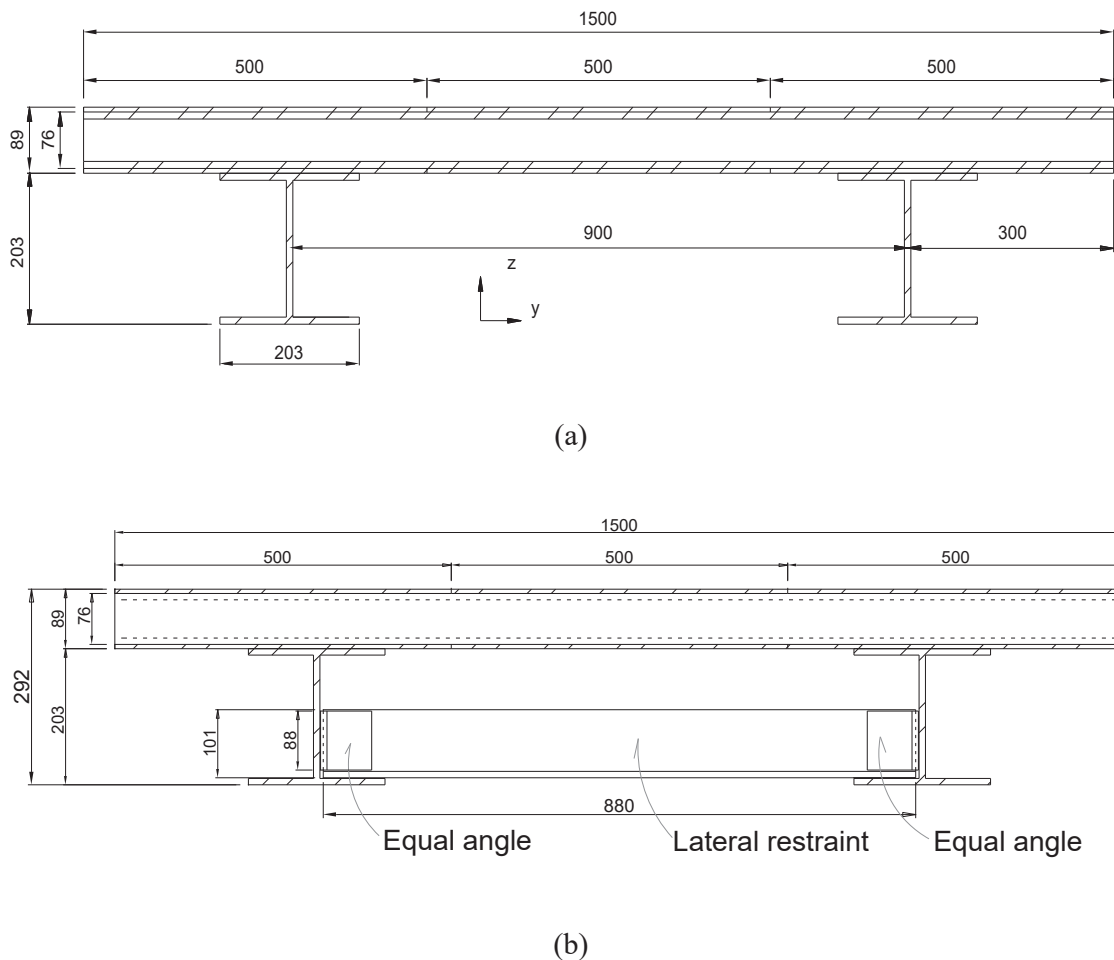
Dimensions of cross-sections along the MB: (a) typical cross-section, and (b) cross-section with T-beams (units: mm).
